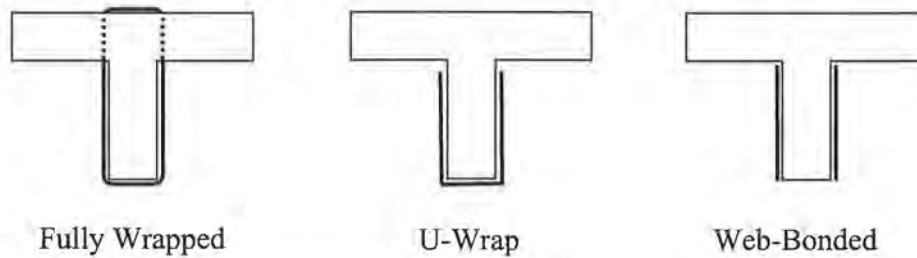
Cross-sectional Configurations for External FRP Shear Reinforcement
